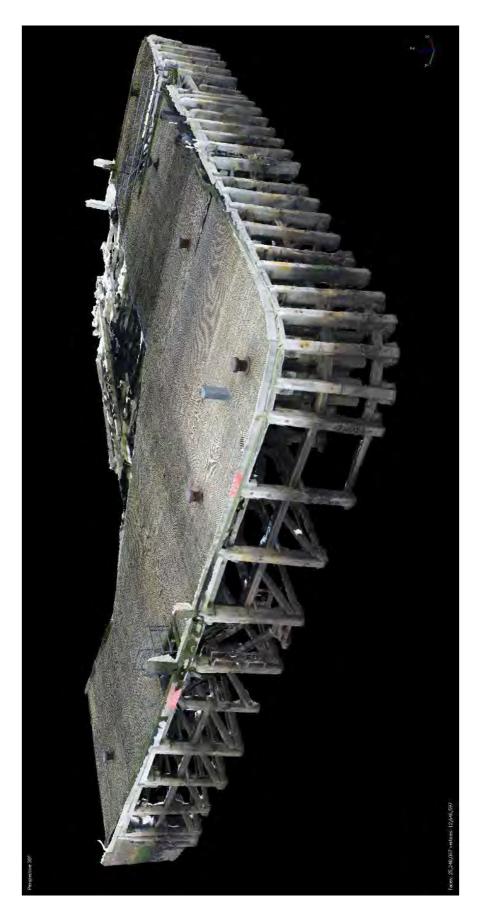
Helensburgh Pier – Screen grab of exterior piling damage
